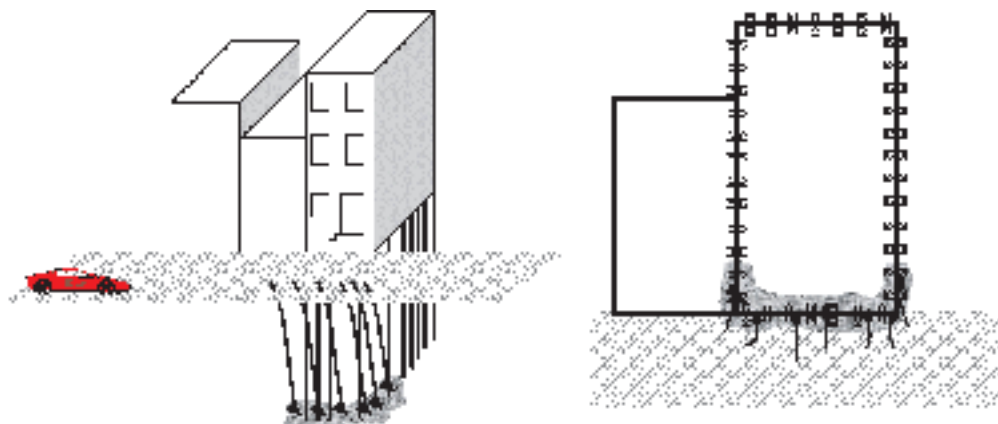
Schematic Presentation of Permeation Grouting Wooden Pile Foundation (Façade Only)
